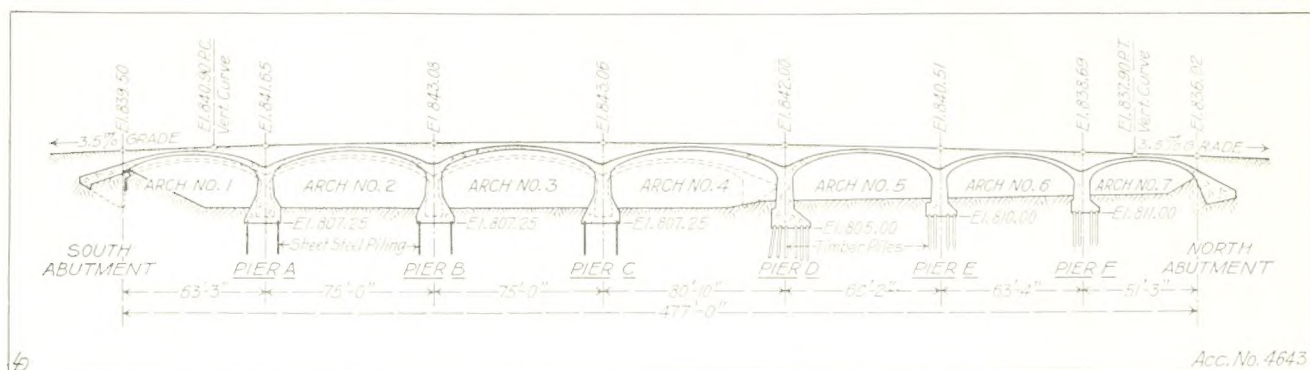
ELEVATION OF THE RECONSTRUCTED ADAMS STREET BRIDGE, TROY.
